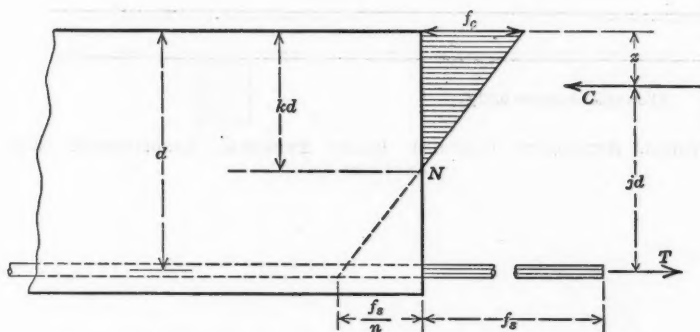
NOMENCLATURE FOR CONCRETE BEAM REINFORCED FOR TENSION.
